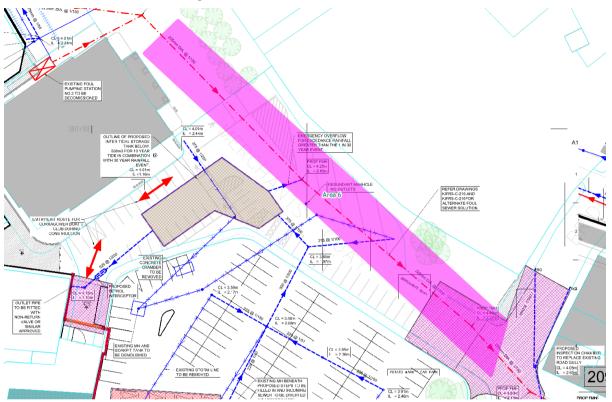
Proposed works at the intersection of Bridge Street, Merchant's Quay and George's Quay.
